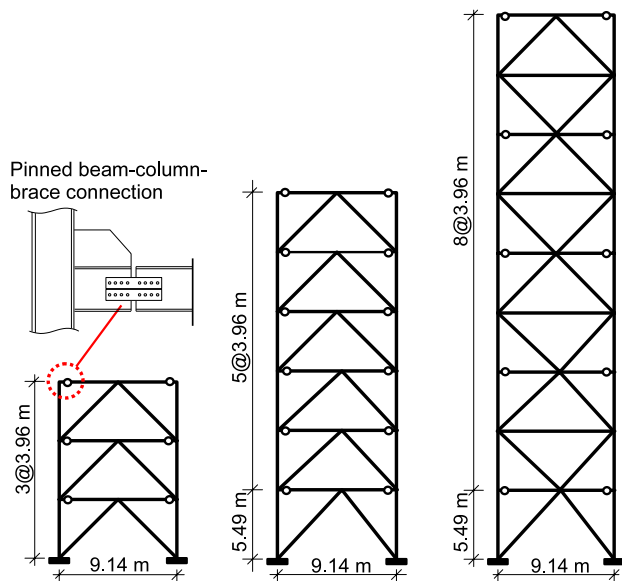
BRBFs and their brace-beam-column connections (a) 3-story (b) 6-story (c) 9-story.
